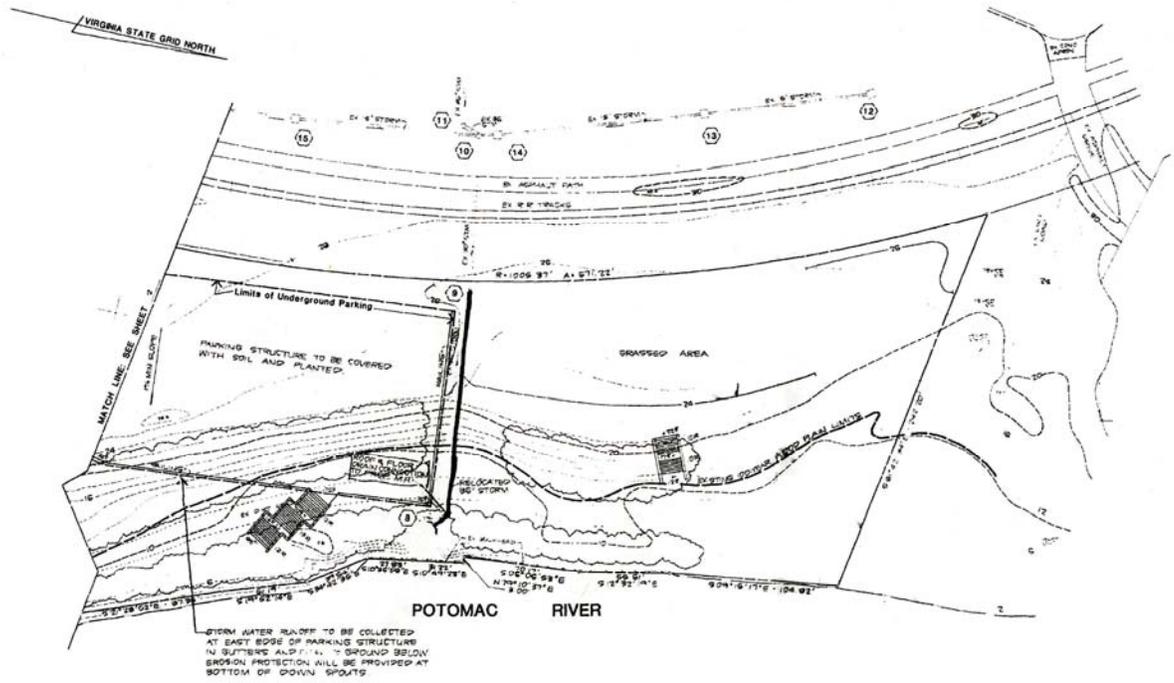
Plan view drawing of the underground garage as it relates to Tide Lock Park north. The plan drawing does not entirely match what exists today on site. Courtesy of the City of Alexandria.
